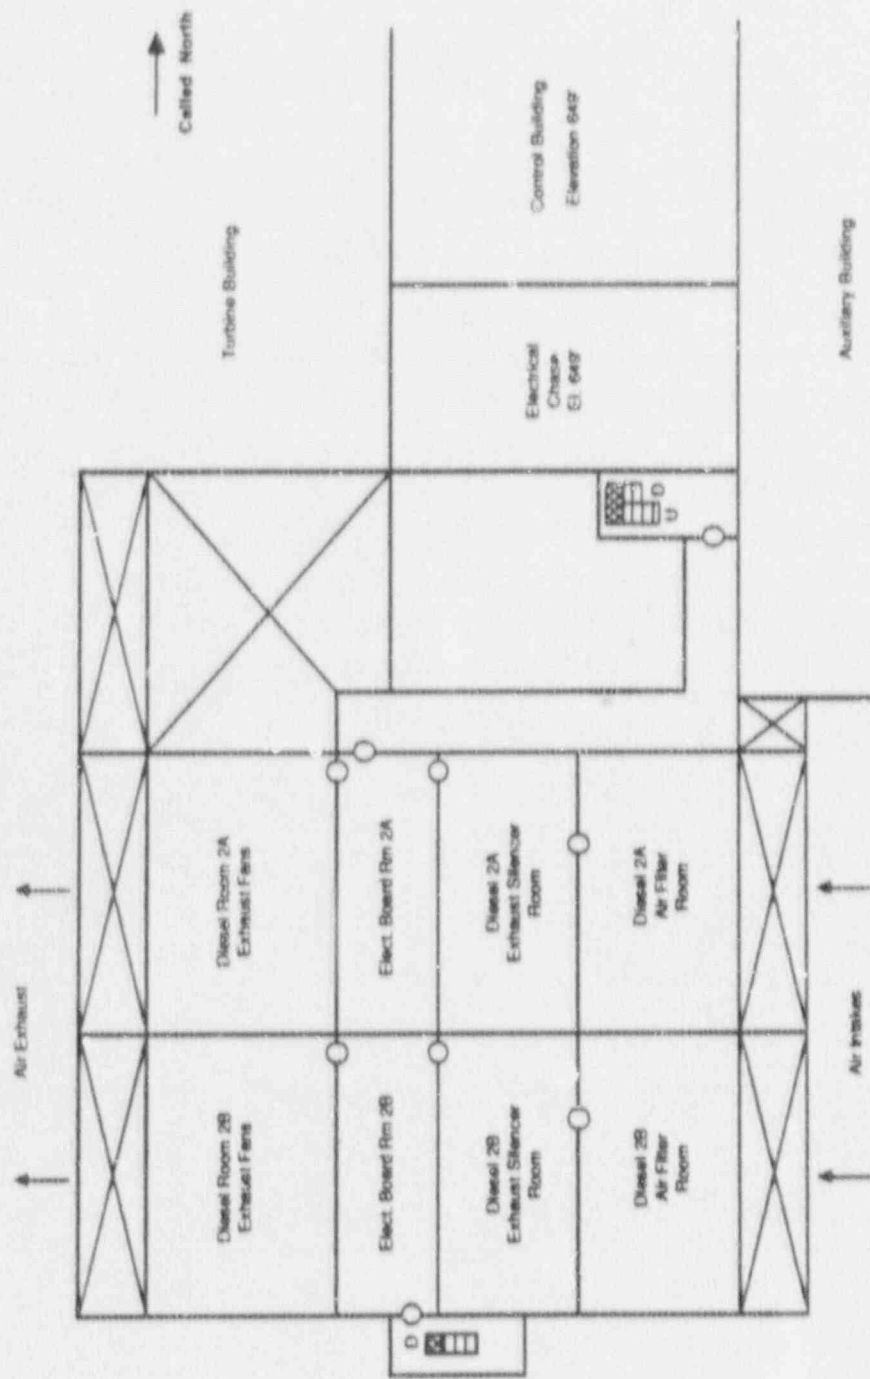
Bellefonte 2 Diesel Generator Building, Elevation 669'-0"
